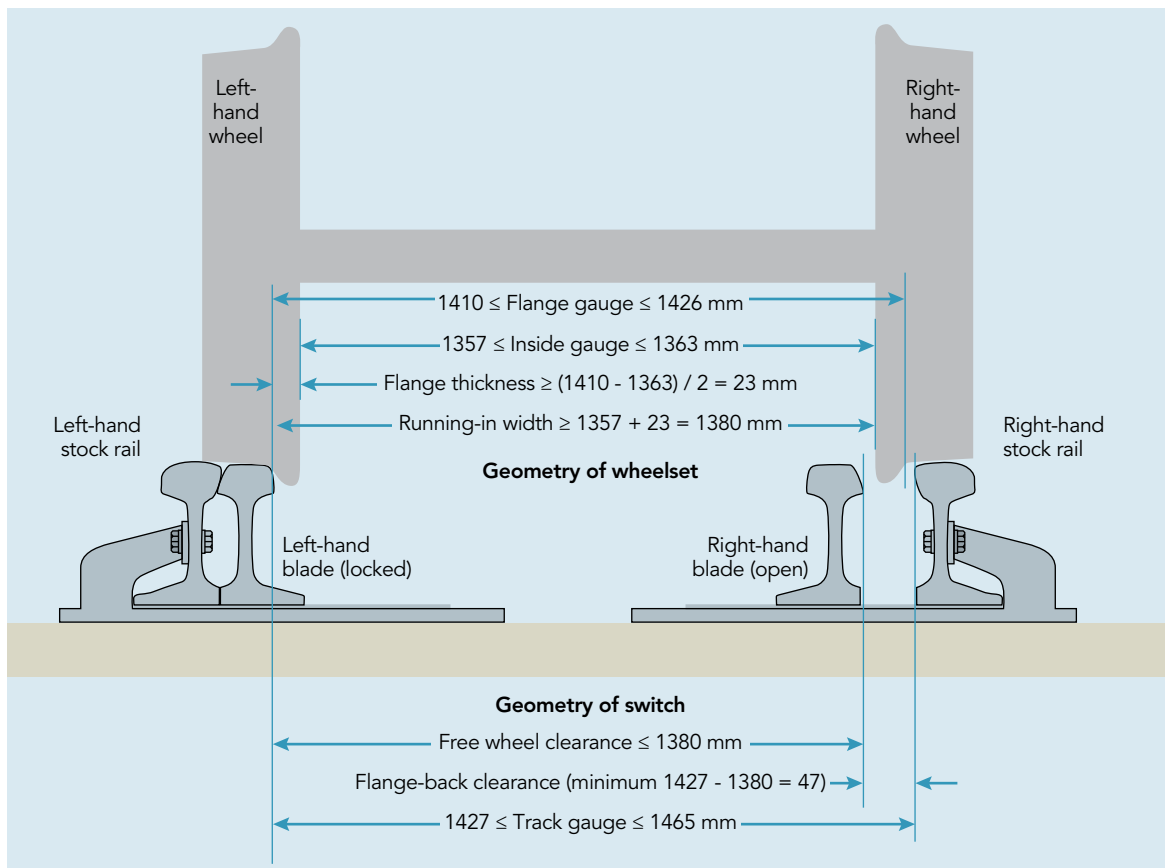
This illustration shows the relationship between the inside gauge and the flange thickness of a wheel set on the one hand and the free wheel clearance of a switch on the other hand.
